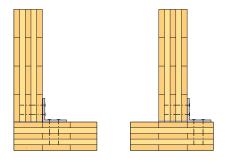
Joint using angle brackets, horizontal cross-section.
